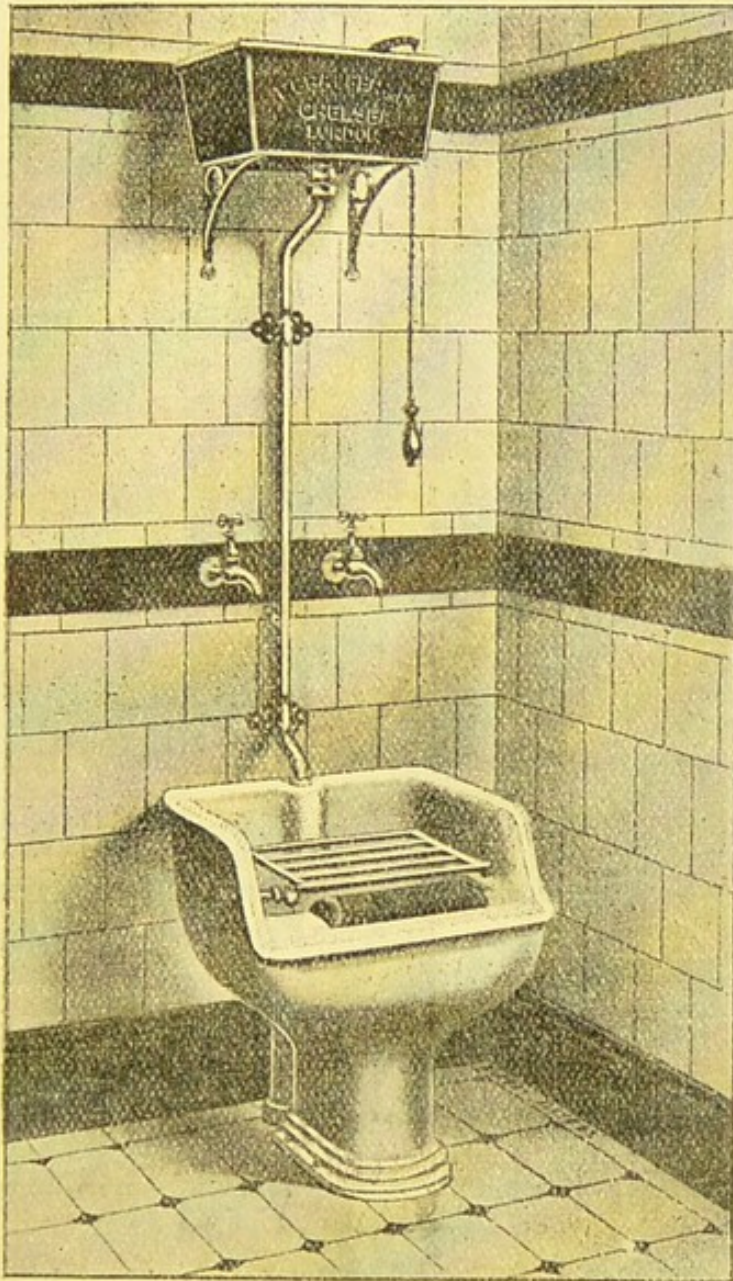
Crapper's improved slop-sink, with flushing cistern.
